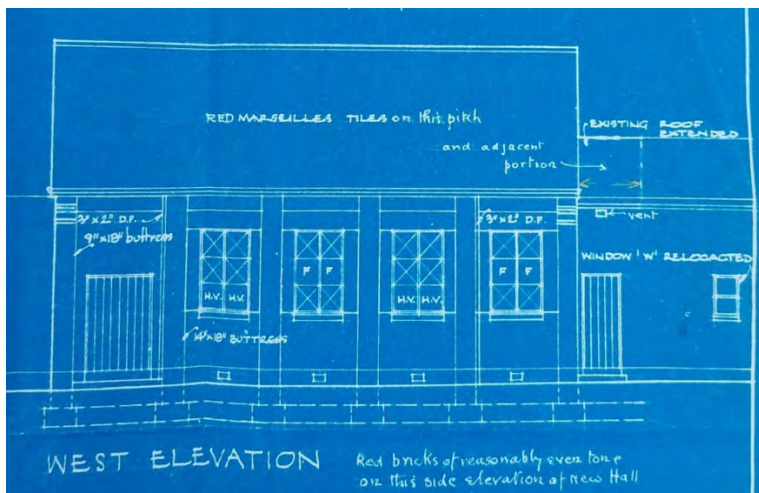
West elevation of the proposed memorial hall, May 1953, by architect Louis R Williams (Source: PROV, PB File)
